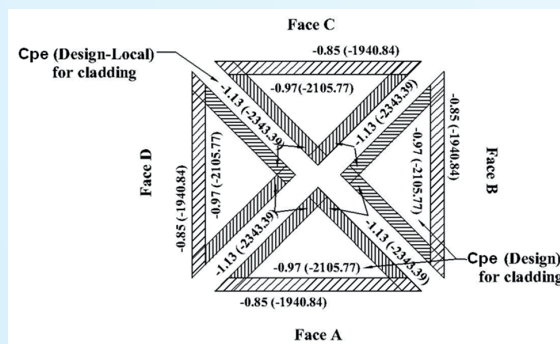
Design for cladding of pyramidal type roof building with roof slope 7.5°
